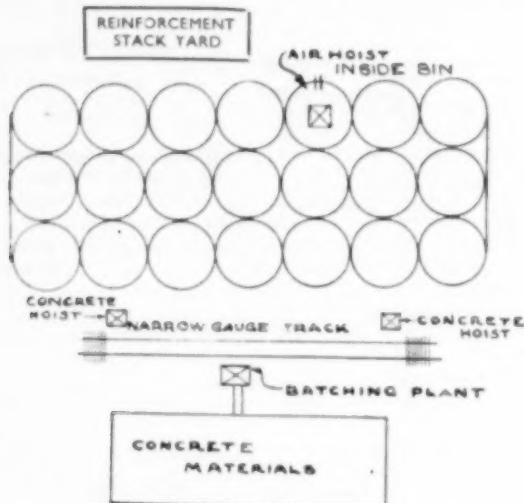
Arrangement with One Large Batching Plant and Mixer.
